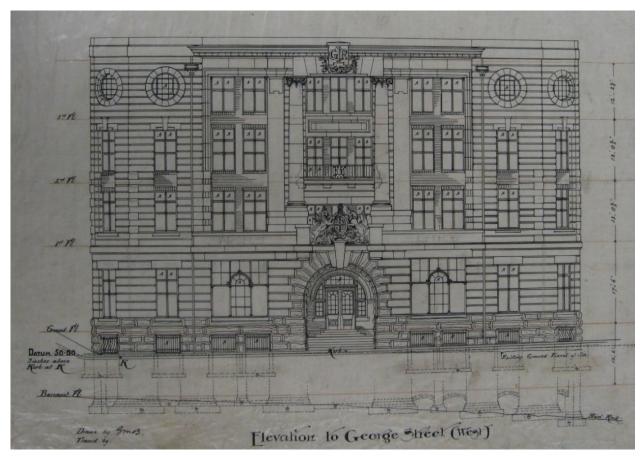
New Parcels Post Office Premises at the Central Railway Station: Elevation to George Street (west), 1910.
